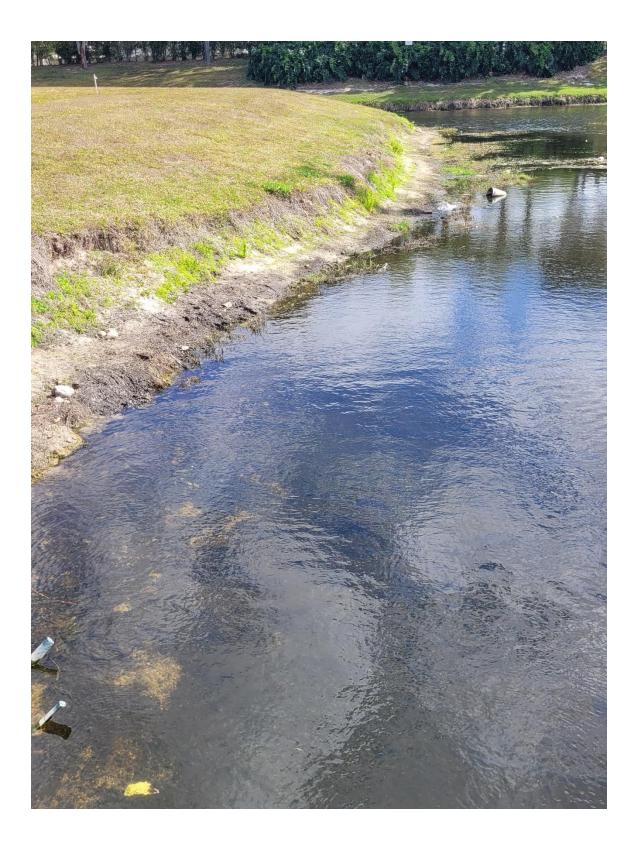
East bank of canal section at Sheridan Street and the 7300 block, looking south. The photo indicates the erosion of approx. 150-feet of the east bank.
